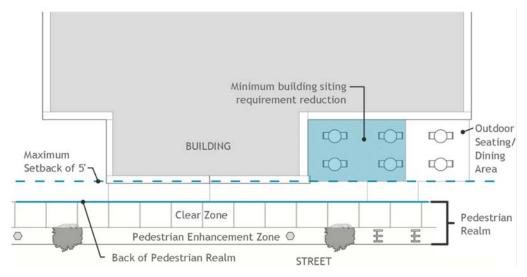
C: Minimum Frontage Requirements – Outdoor Seating and Dining
